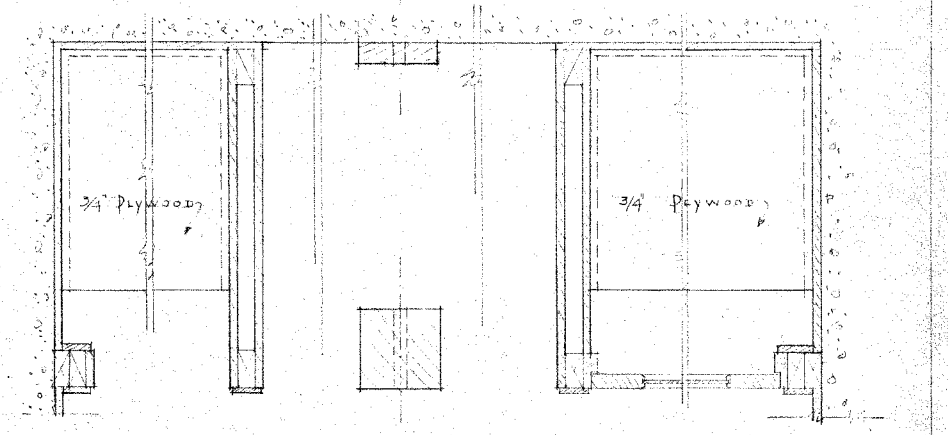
DETAIL SEWING RM. SHELF SCALE 1/2\"/>
